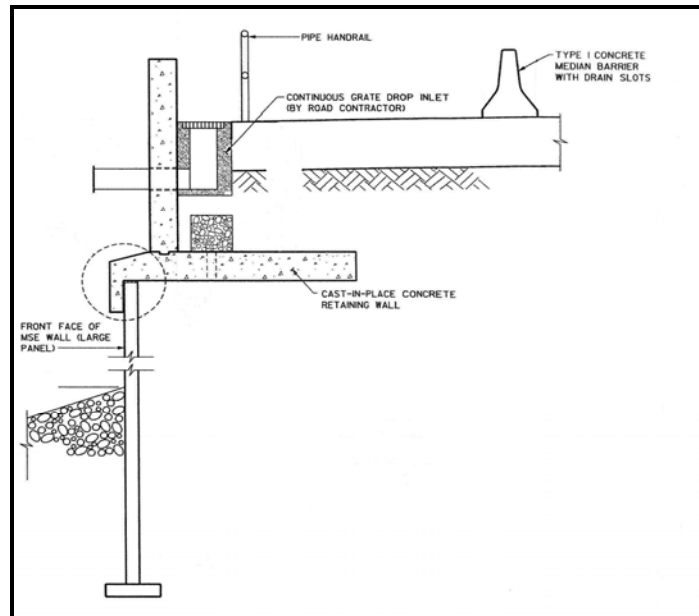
, Hybrid Wall – Cantilever Concrete over MSE Wall
